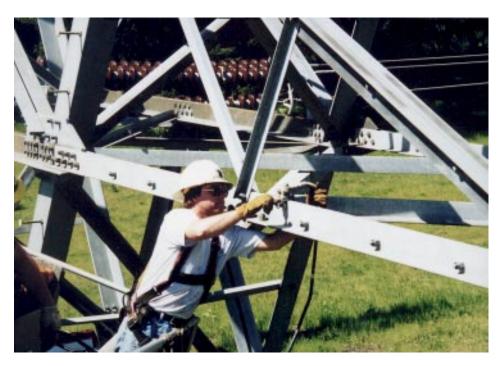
The hoist is removed and the last step will be to remove the conductor grip.
